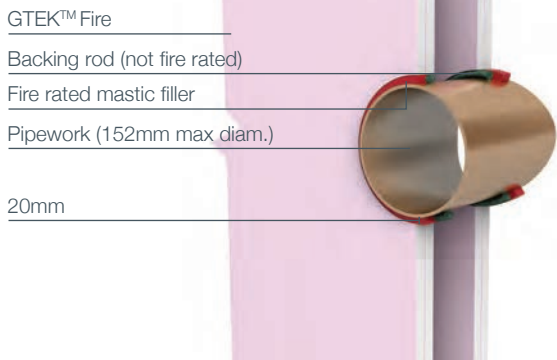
PIPE PENETRATION THROUGH CEILING
